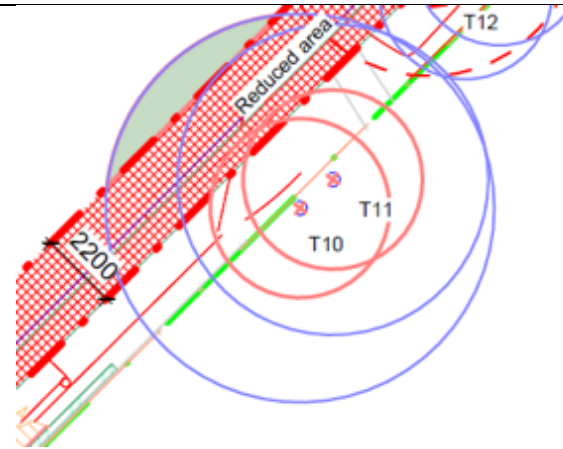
Basement 1 Plan – Tree 11 - Showing suspended slab (couter level).
